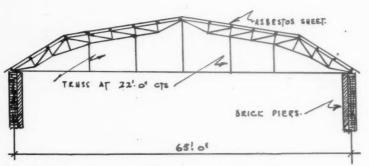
Composite tubular roof truss used in conjunction with brick construction.
